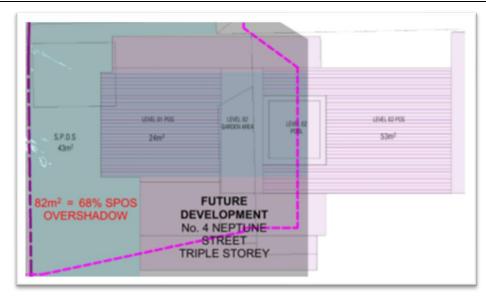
2pm, 3pm shadows at No. 4 Neptune Street
